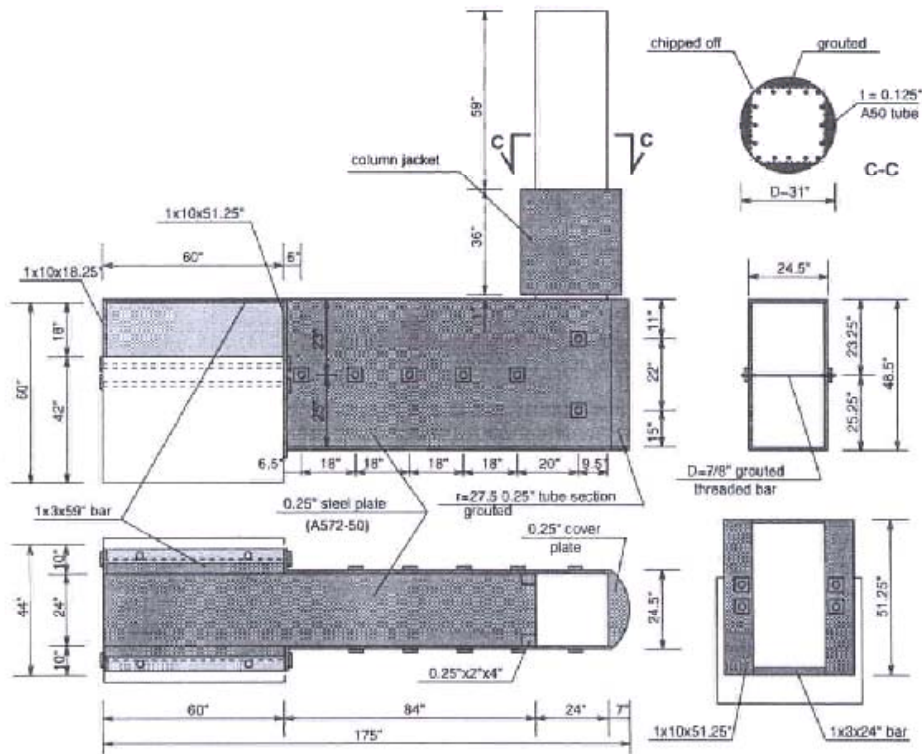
Final Steel Upgrade Details of the As-Built Long Specimen (Adapted from Stojadinovic and Thewalt, 1995)
